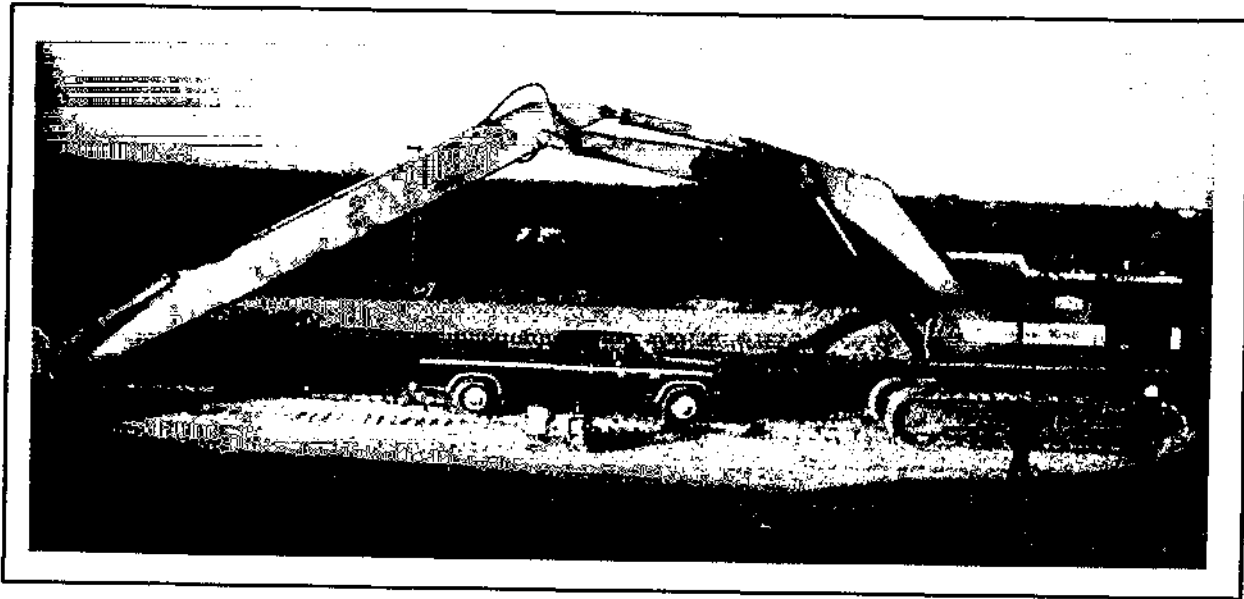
Backhoe for Excavating Slurry Trench.
